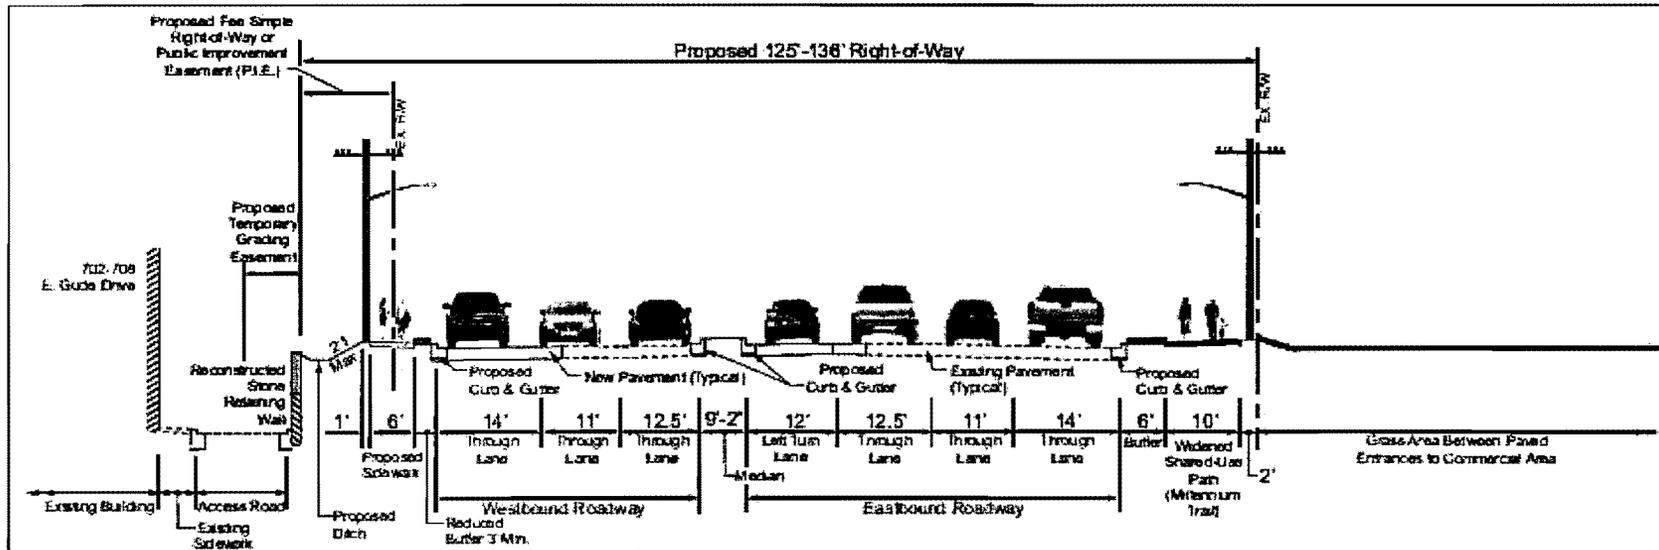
Alternative 3: Enhanced Master Plan, Recommended Alternative. Proposed typical roadway along East Gude Drive at Section B-B, approximately 2000' east of Calhoun Drive.
